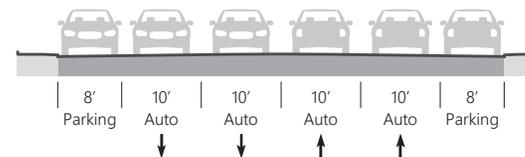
STATE STREET EXISTING CROSS SECTION
